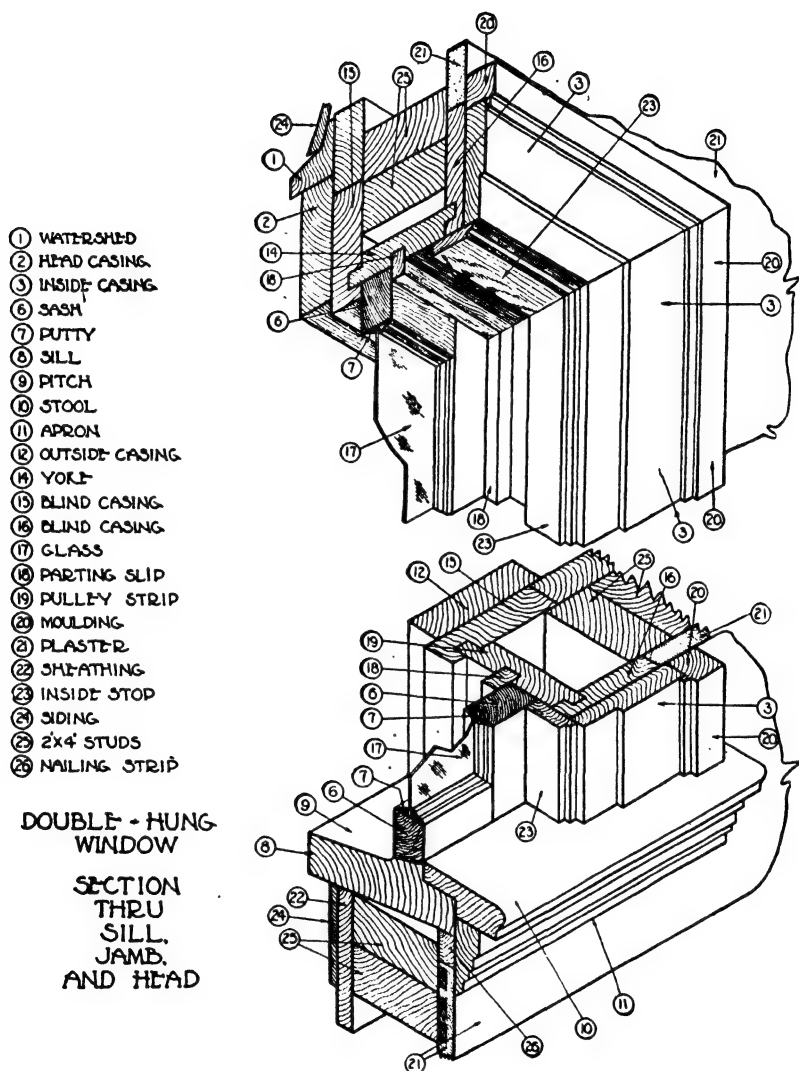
Plate VIII. Isometric View of Window in Fig. 11 Showing Section through Sill, Jamb, and Head
